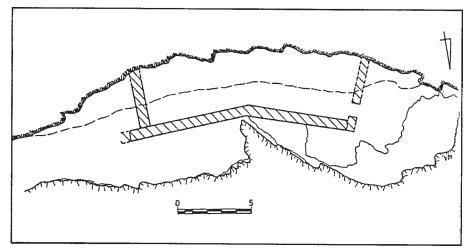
A shelter for guests and pilgrims (?) on the southern bank of Wadi Abu Shu'la. Plan.
